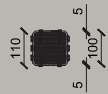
Plan of Bollard Arrangement as Bicycle Stand (1:20) (Author, 2014).
